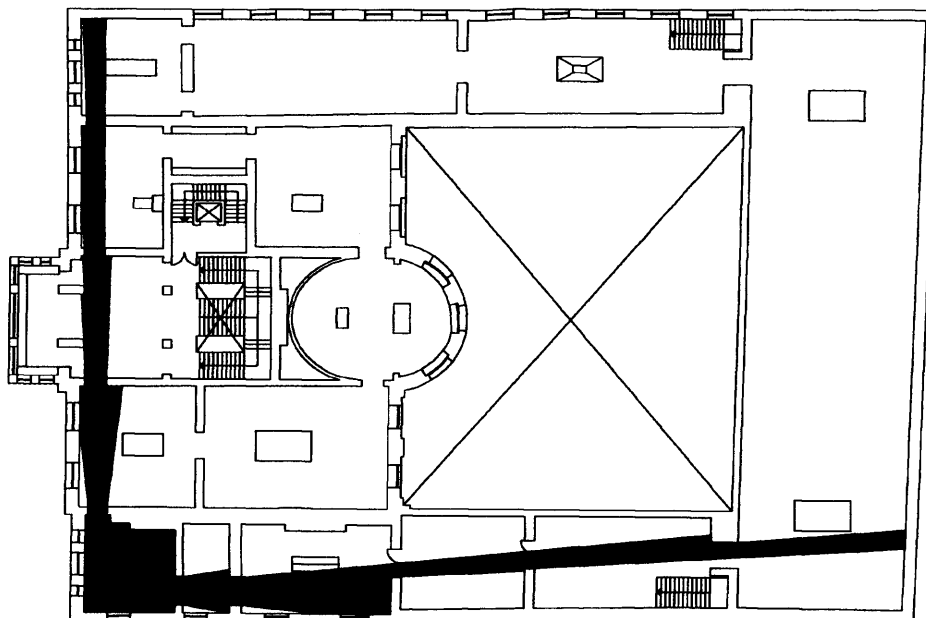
Wallace Collection, isovist from East Drawing Room on the first floor
